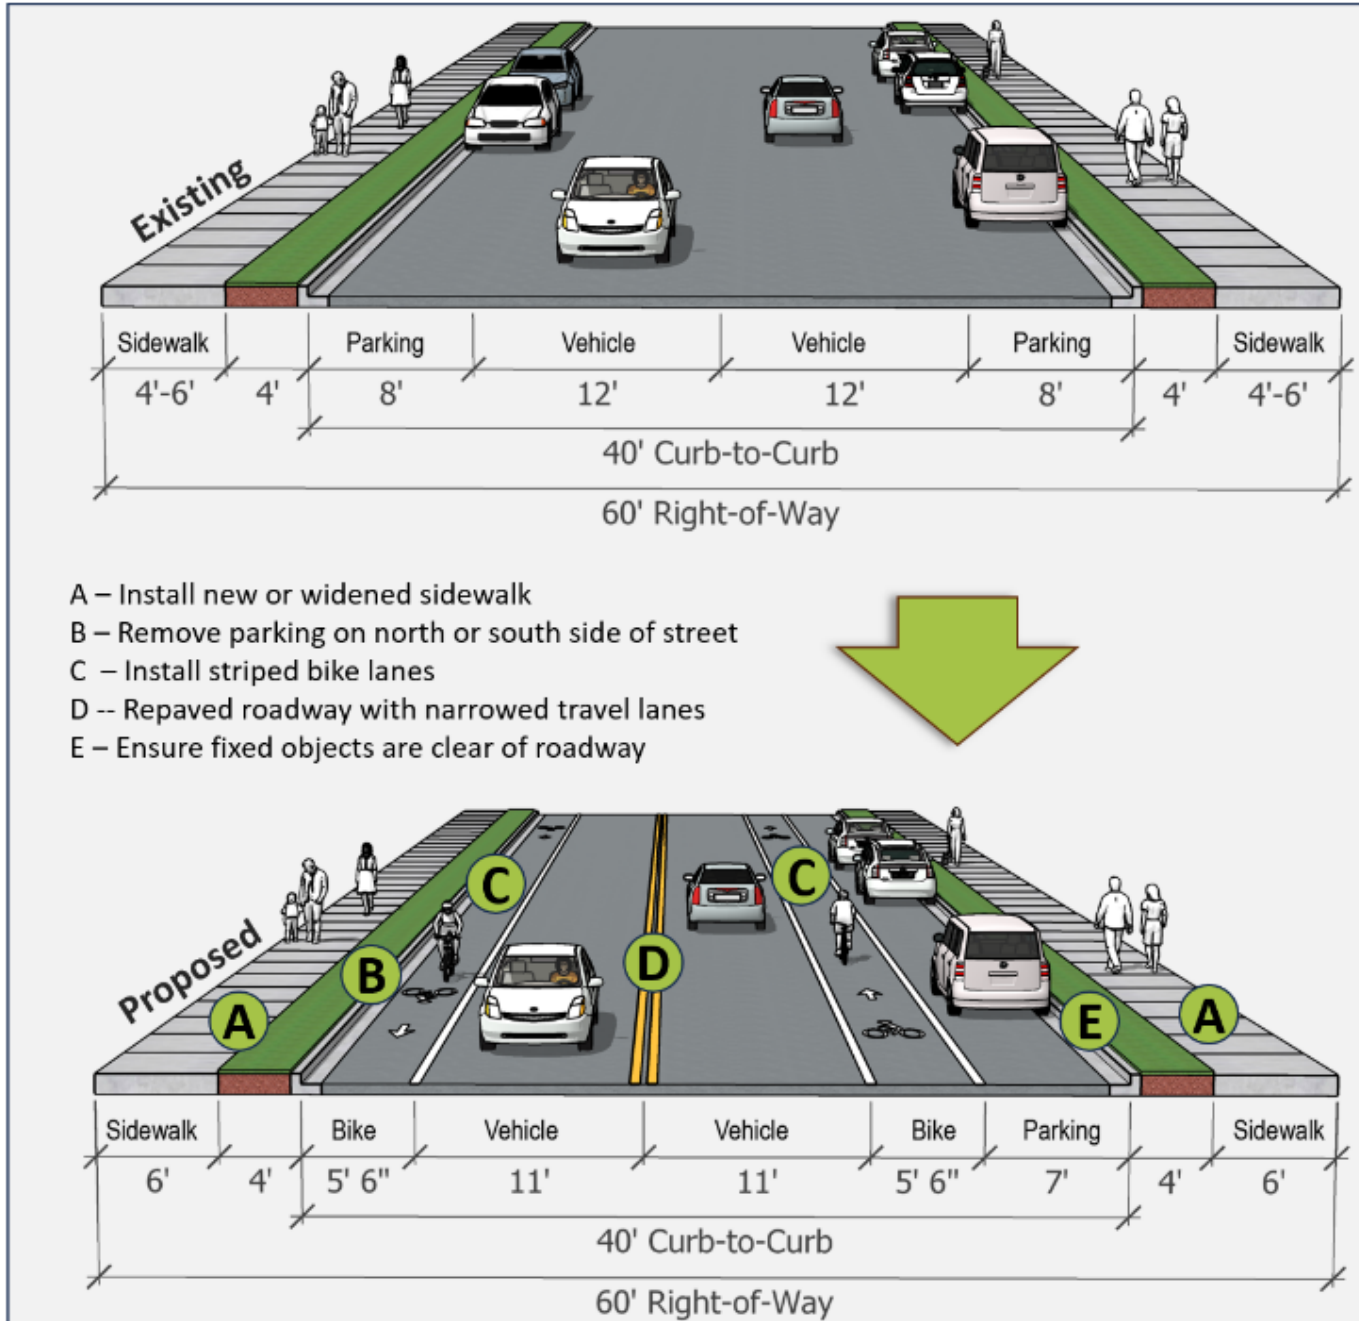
Locust Street (Wilco Street to First Avenue)
